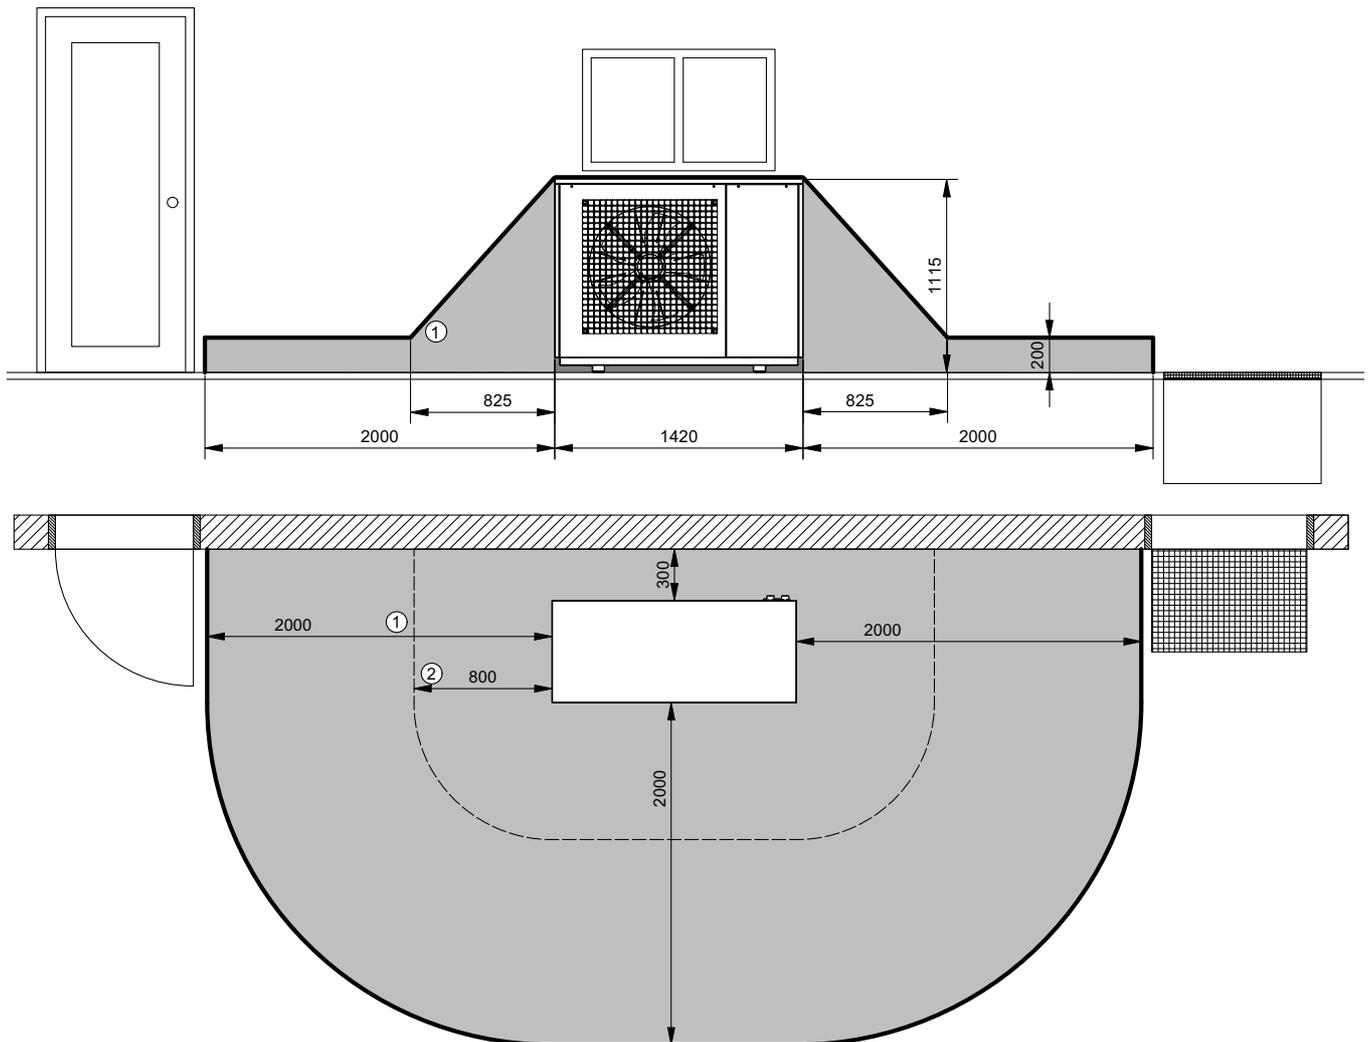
Safety zone (floor level installation) around the heat pump
